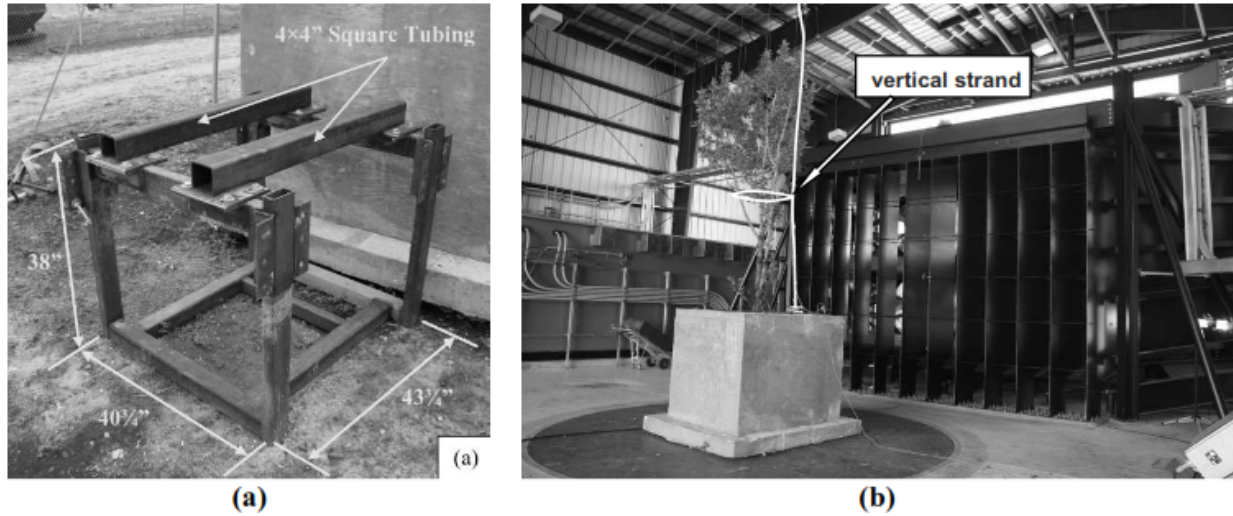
Full-scale testing Phase 2: (a) steel cage proposed for securing the tree in the concrete box and (b) the full-scale tree in a reinforced concrete box as a representative sectional model of the full-scale balcony.
